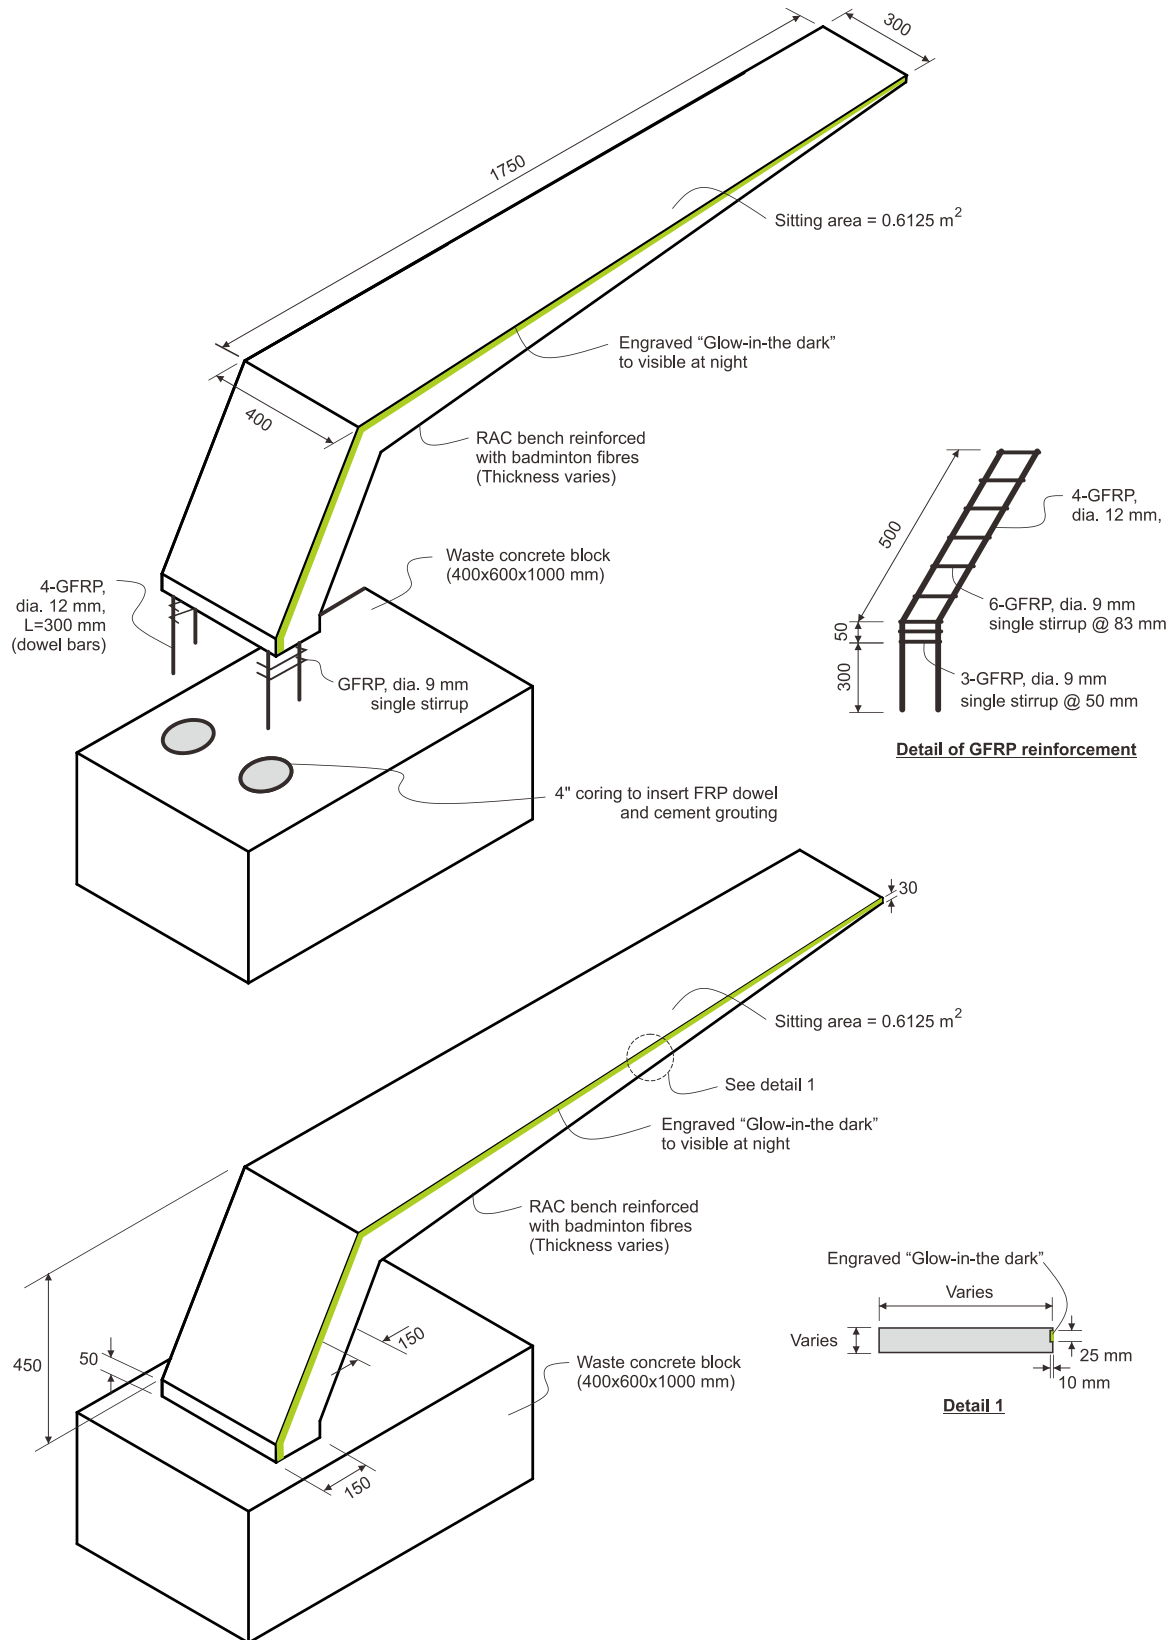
Bench geometry, reinforcement details and construction of RAC cantilever bench.
